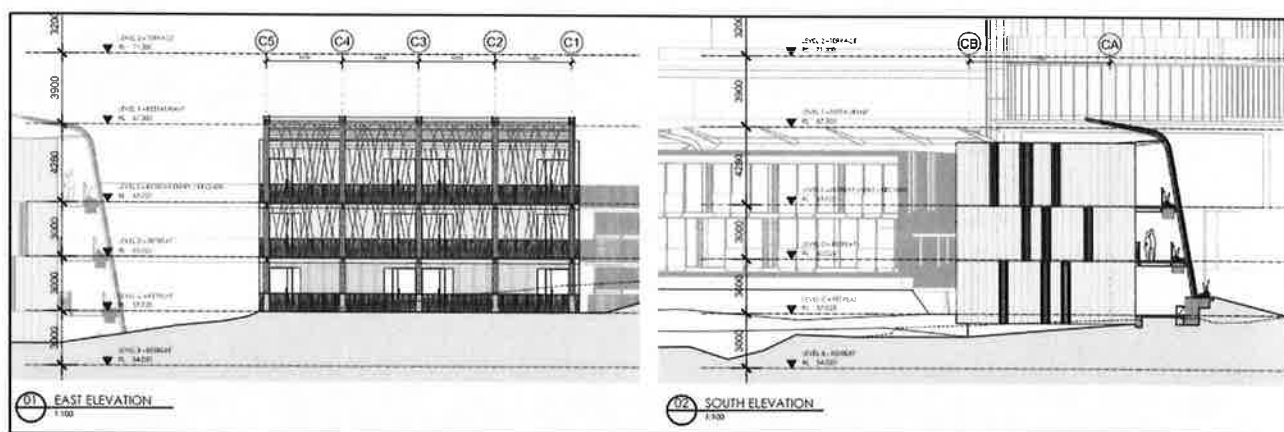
Eastern and southern elevations of three storey Pod C (Source: Architectural Plans)
